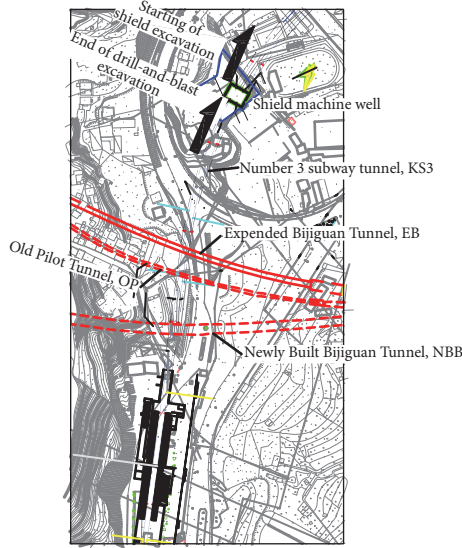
Plan of KS3 tunneling overlying three existing tunnels.
